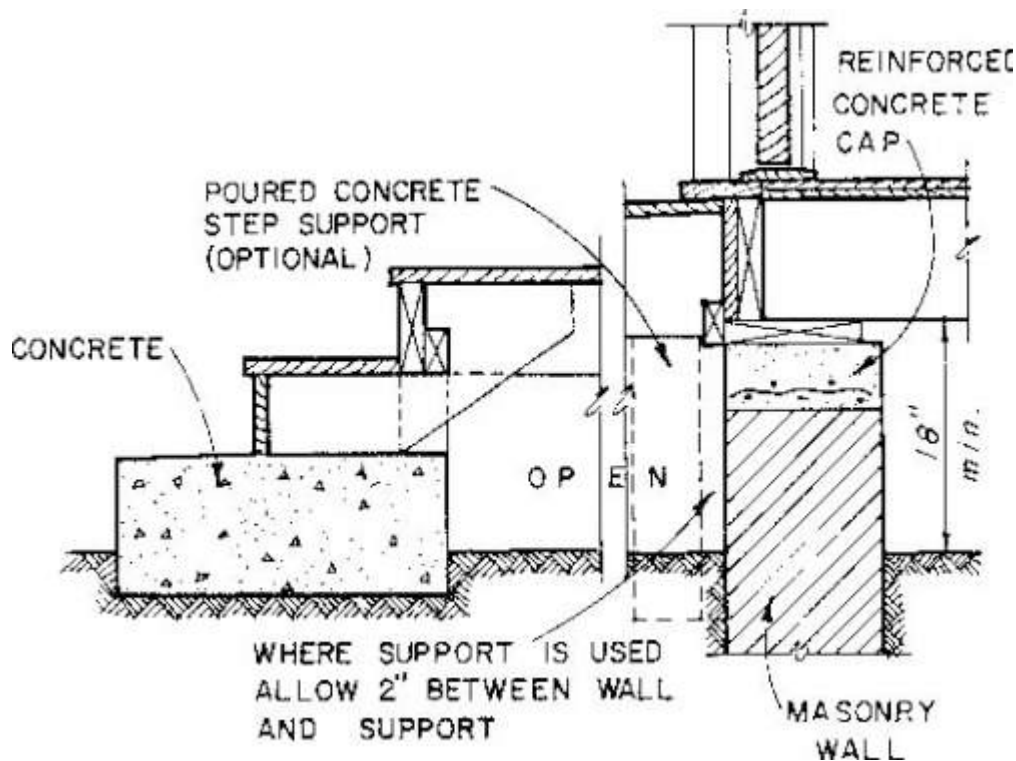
Construction of wooden steps of a porch to prevent hidden termite entry (graphic adapted from USDA)
